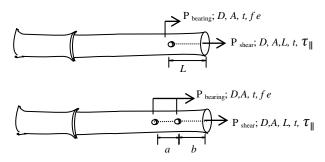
Arrangement of bolt, (a) specimen with one bolt (b) specimen with two bolts
